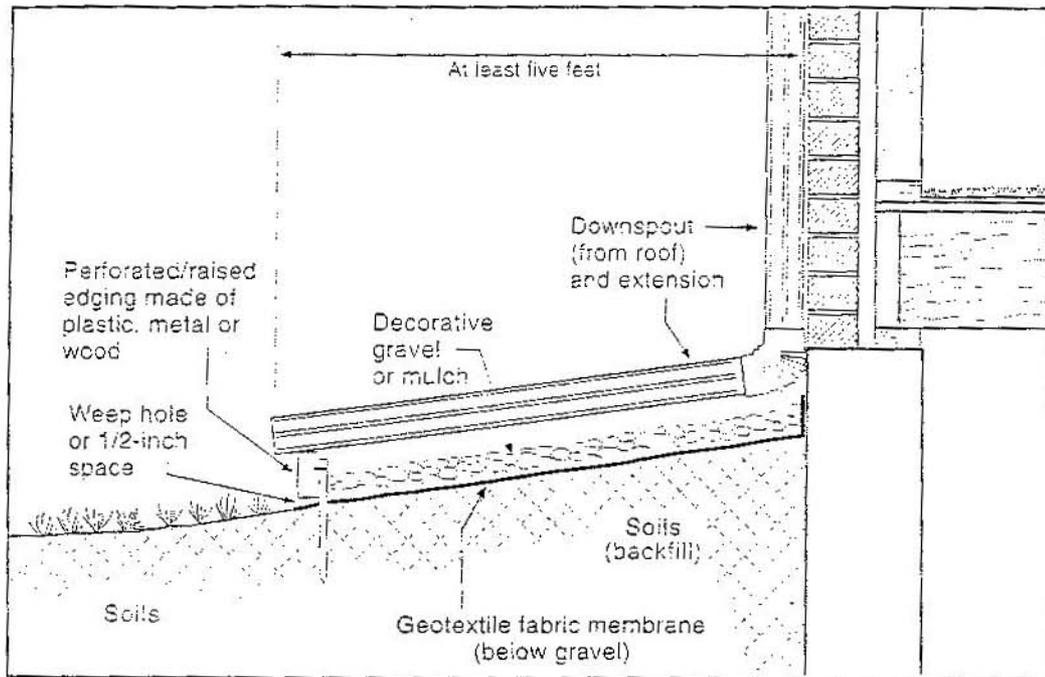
Properly designed runoff slope next to a house foundation. Note that roof drainage is carried by a downspout extension to a point beyond the slope. (From Holtz and Hart, 1978.)
